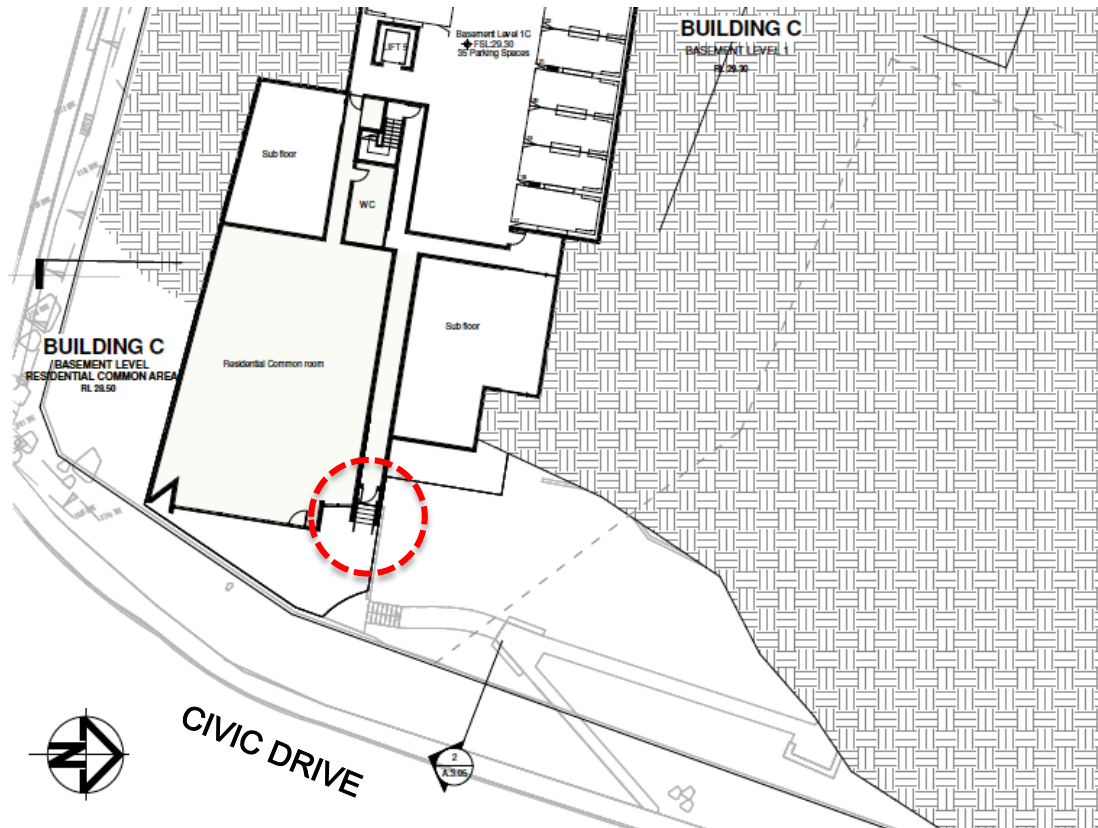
Approved Basement Parking Plan 1 (extract from DA/2018/1574 A2.02/C)
